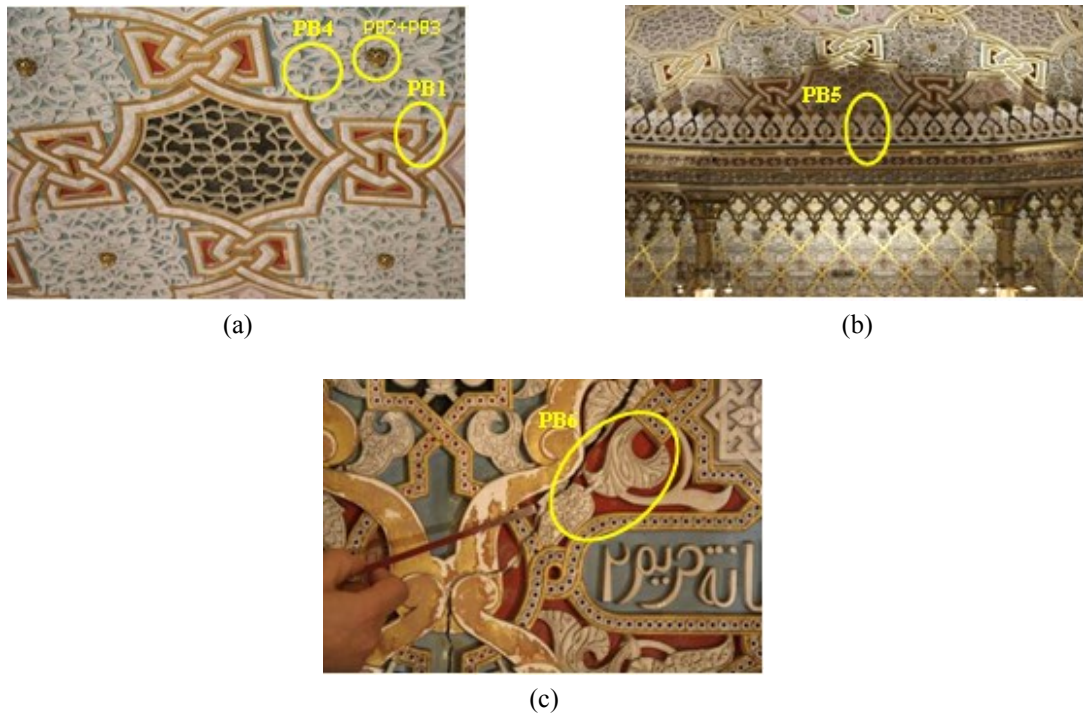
Detail of some stucco decorations with indication of the ornaments corresponding to the samples collected: (a) ceiling; (b) crowning of the cornice that delimits the ceiling; (c) wall of the gallery on the first floor
